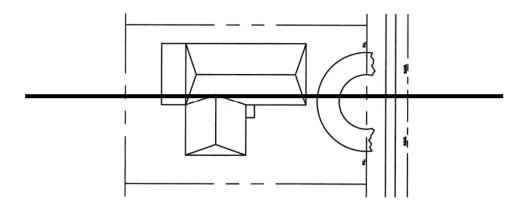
B. Two spaces are provided with an 18'x18' slab.
